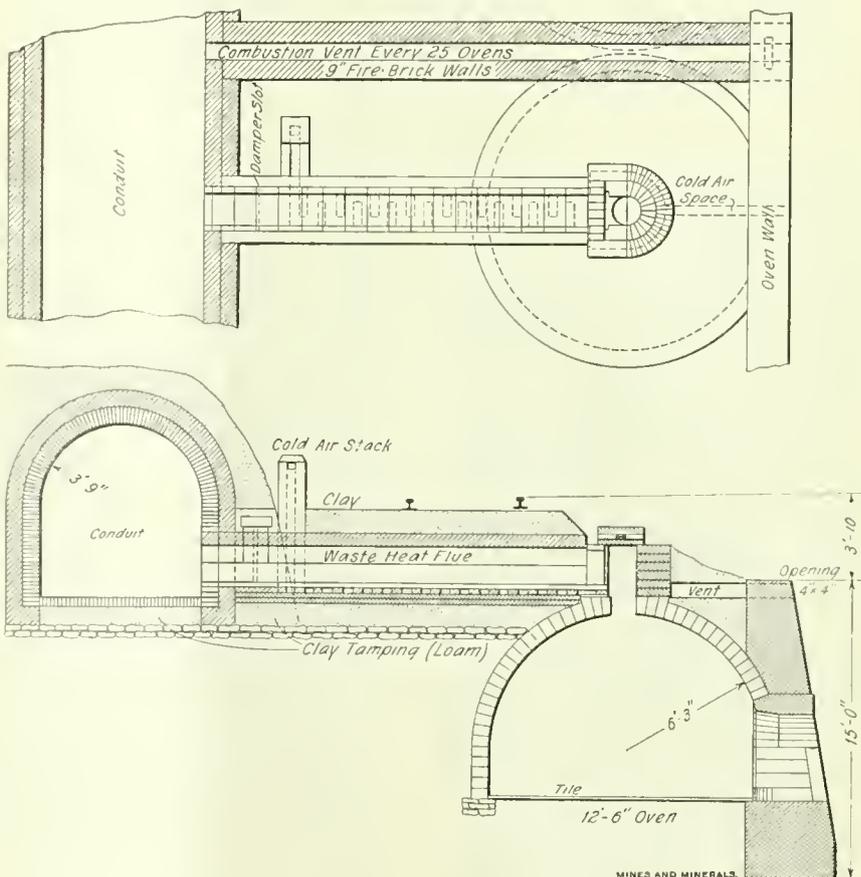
PLAN AND ELEVATION OF WASTE HEAT COKE OVENS
